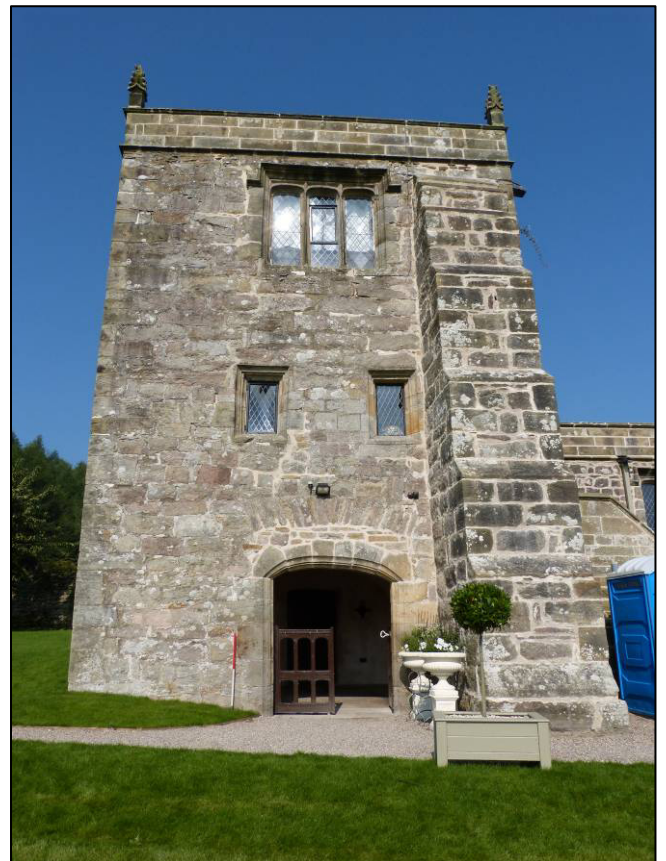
Tower, south elevation, after repair and conservation works, looking NW (photo 7/578).
